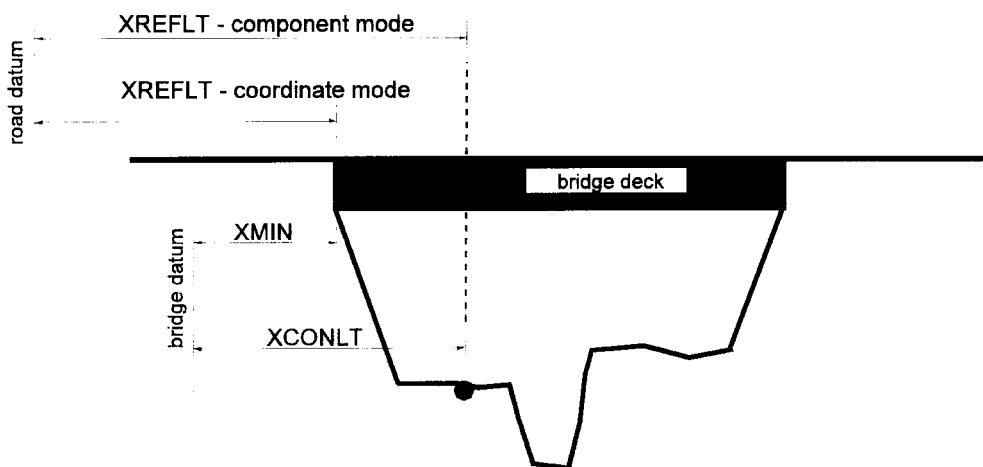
Datum correction between bridge opening and road grade sections.
